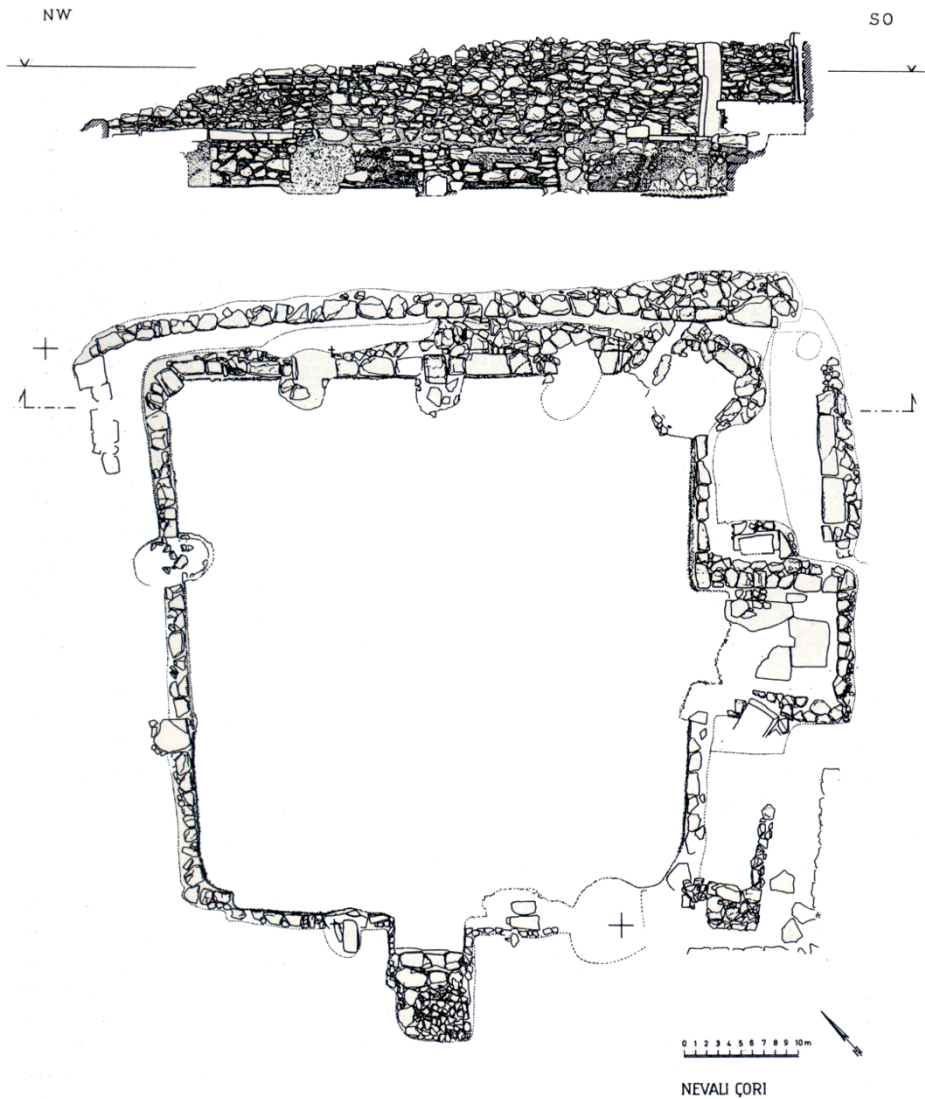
Nevalı Çori. Section drawing and ground plan of Cult Building II (Hauptmann, 1993, p. 44).
